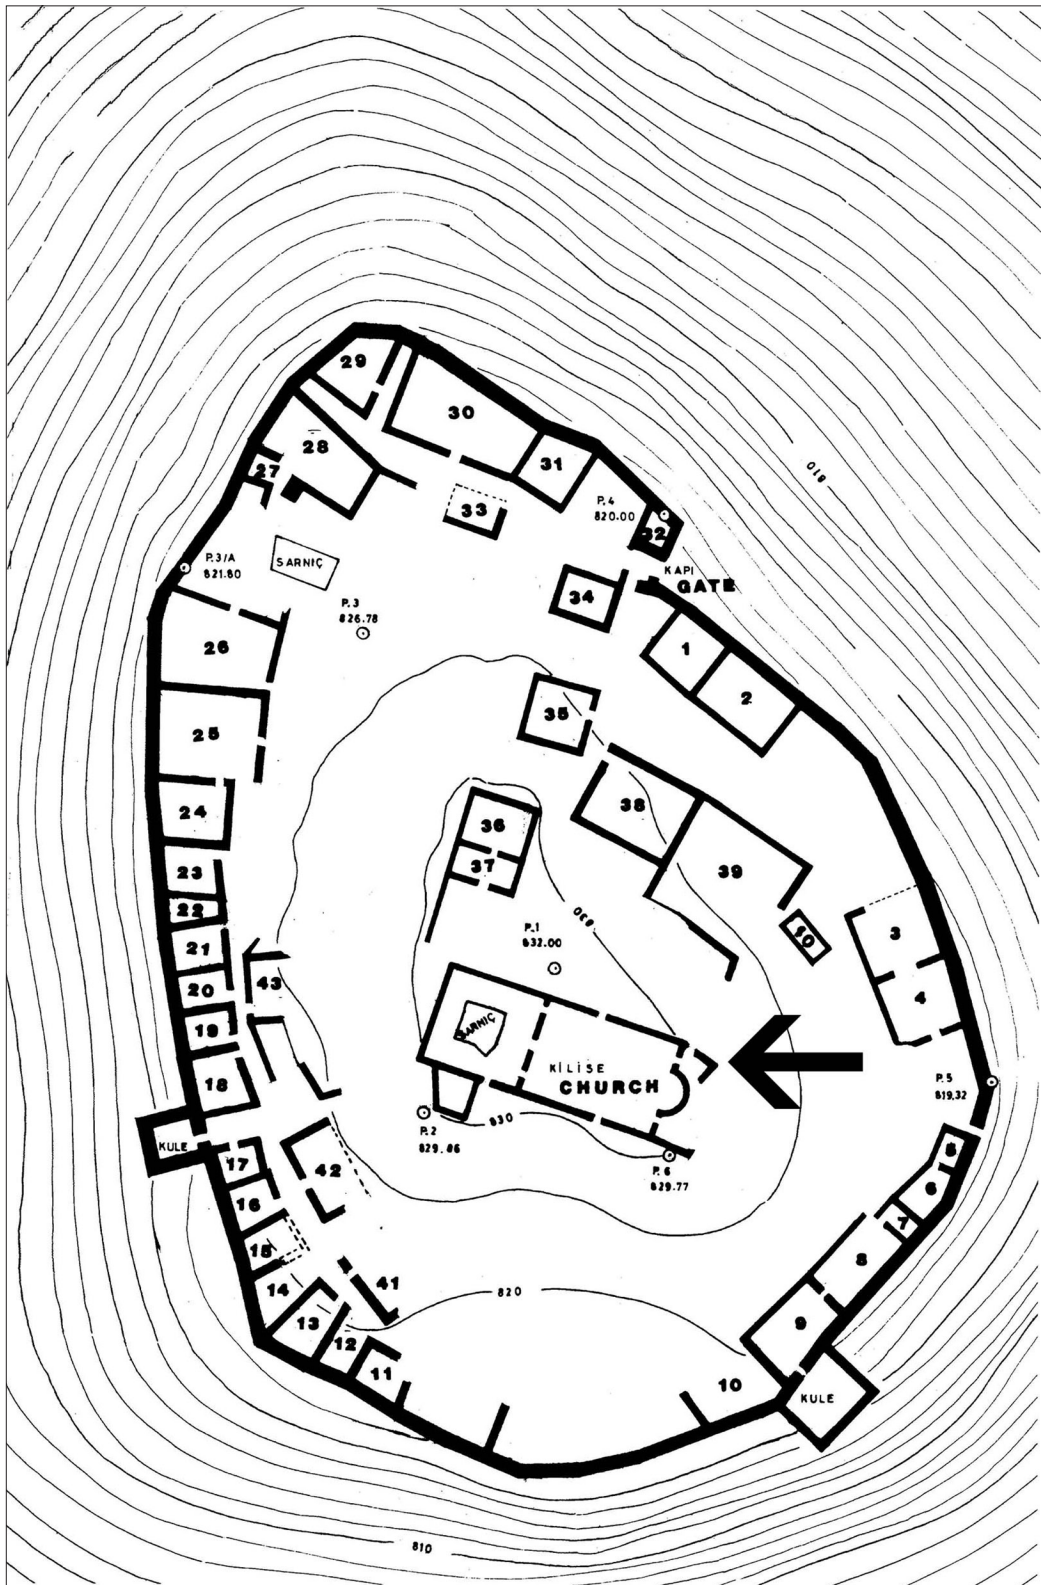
Ören Tepe site plan modified with arrow to indicate building under church (Aydalet al. 1997, fig. 8).
